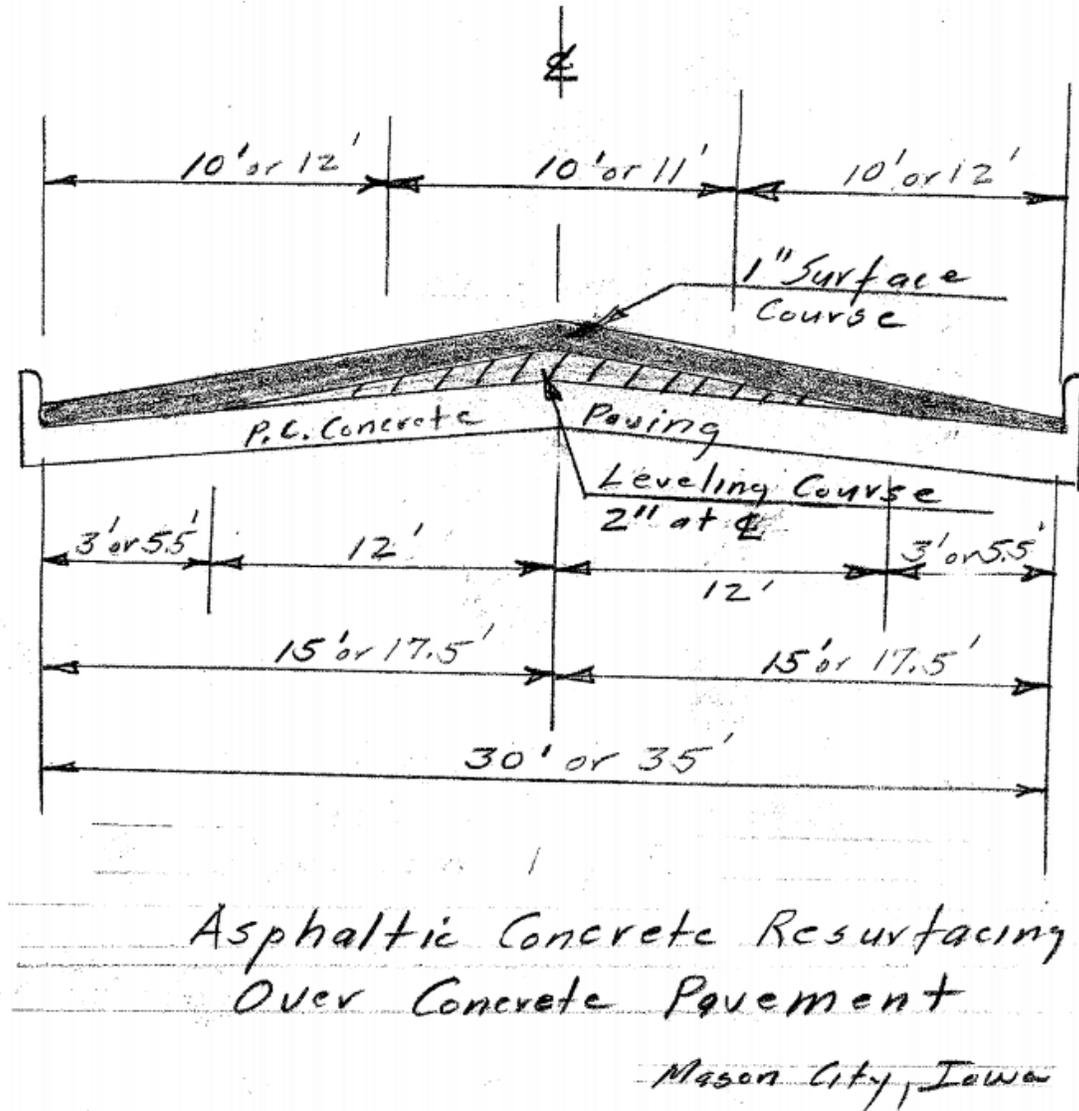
Existing pavement cross section for Pennsylvania Avenue
